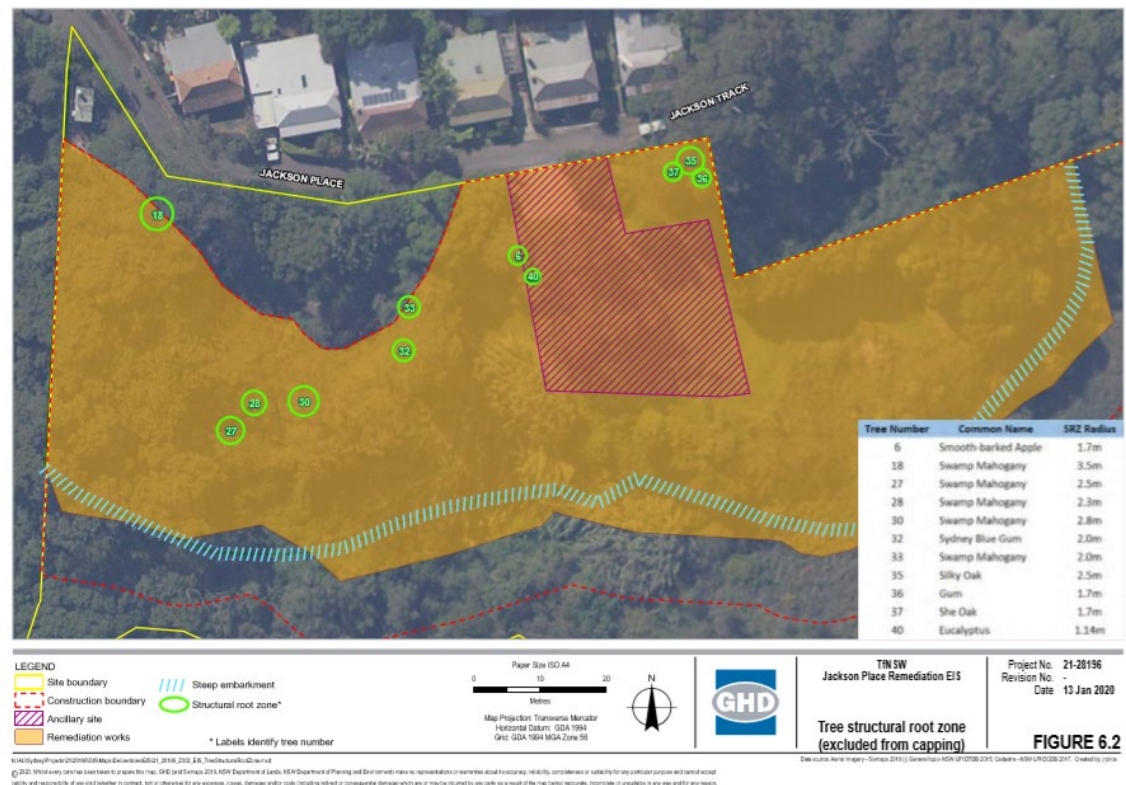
Location of Tree Structure Root Zone to be protected Source: GHD
